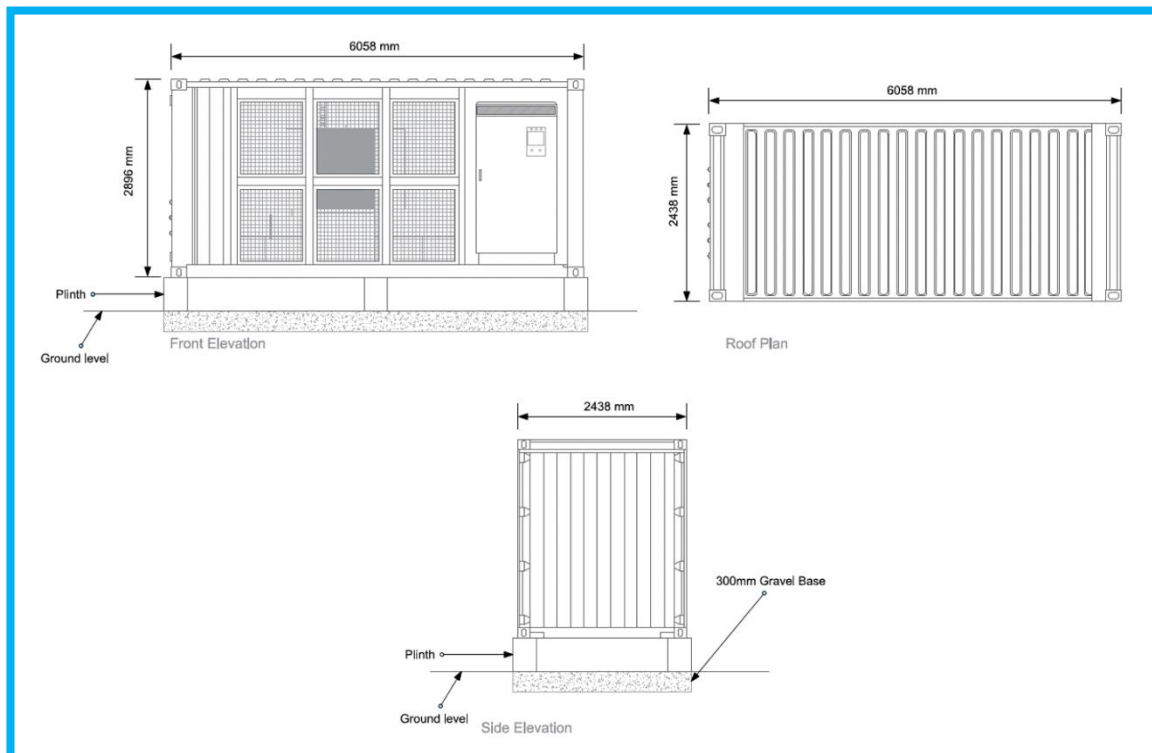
Inverter elevations and dimensions layout. These are to be supported on plinths founded within a 300mm bed of permeable gravel to infiltrate runoff as for containerised units above.
